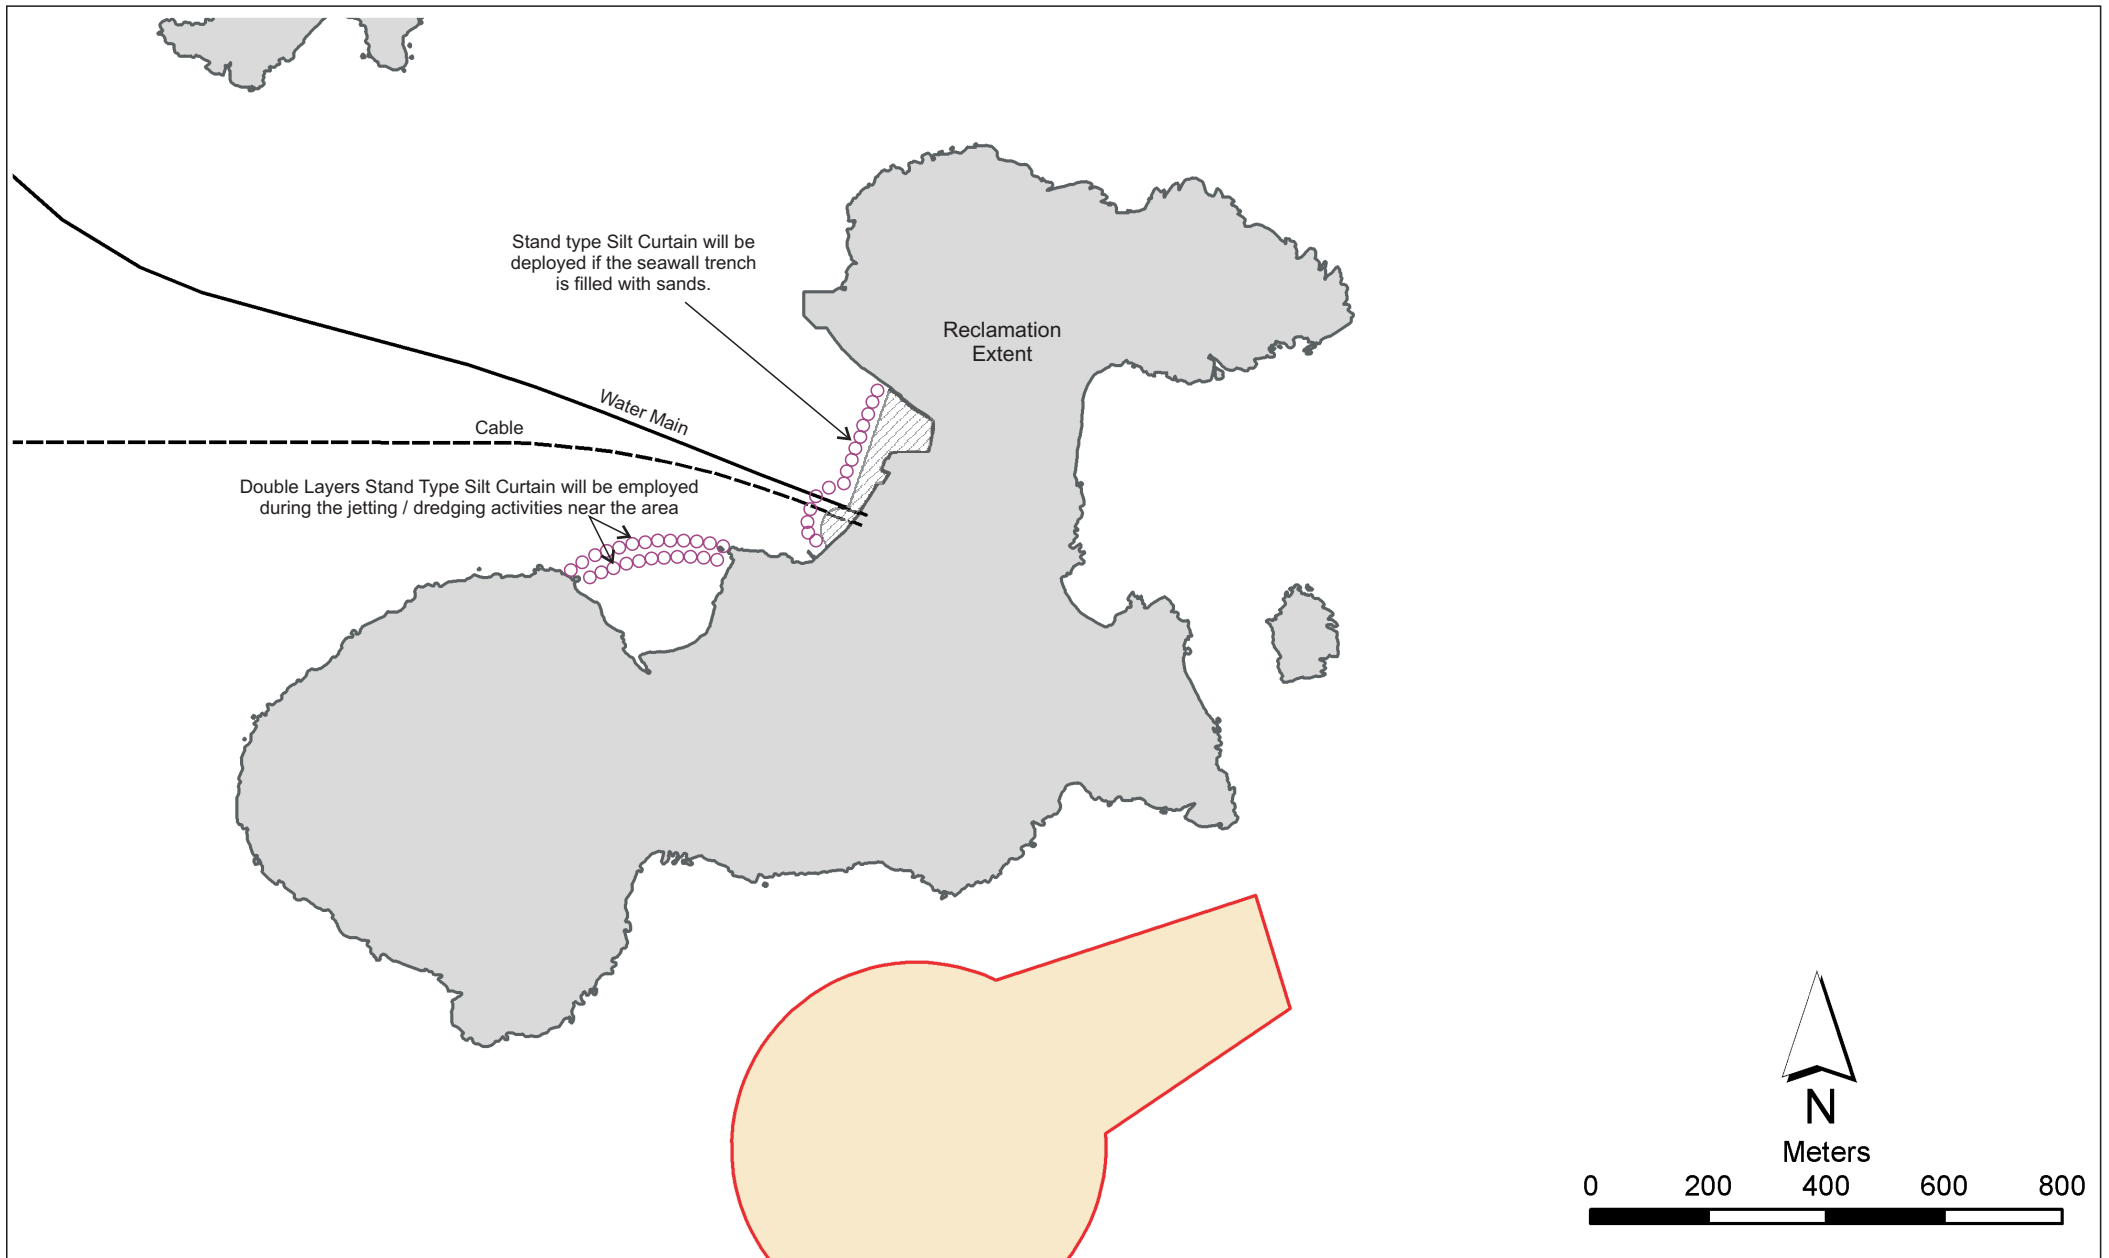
Indicative Arrangement of Silt Curtain (Stand Type) for Jetting / Dredging and Sanfilling Activities near South Soko
